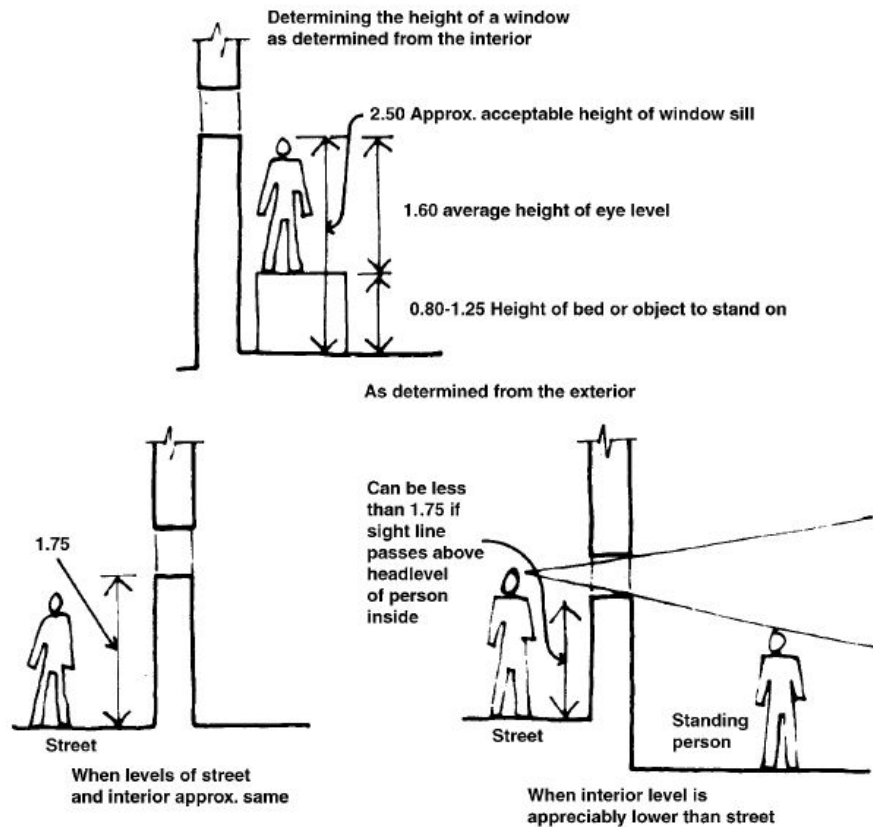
Preservation of the privacy at ground level by determining the height of opening (source: hakim, 1986)
